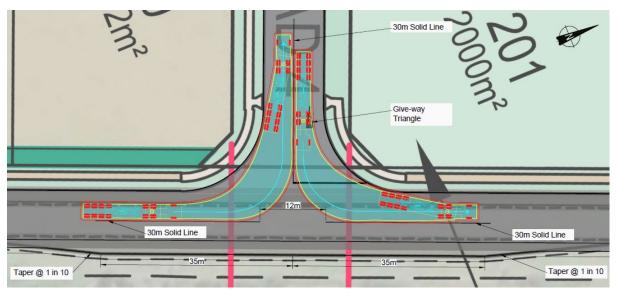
Proposed Grays Road / Site Access Road Intersection (Typical)
